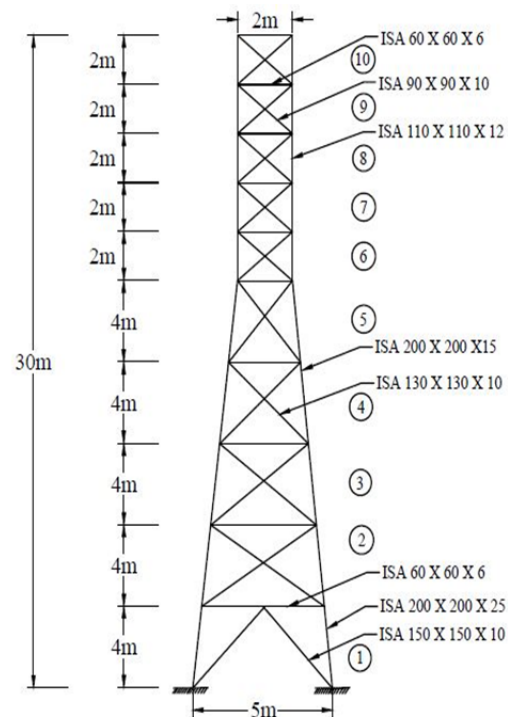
Details of Microwave Lattice Tower of 30 m Height
